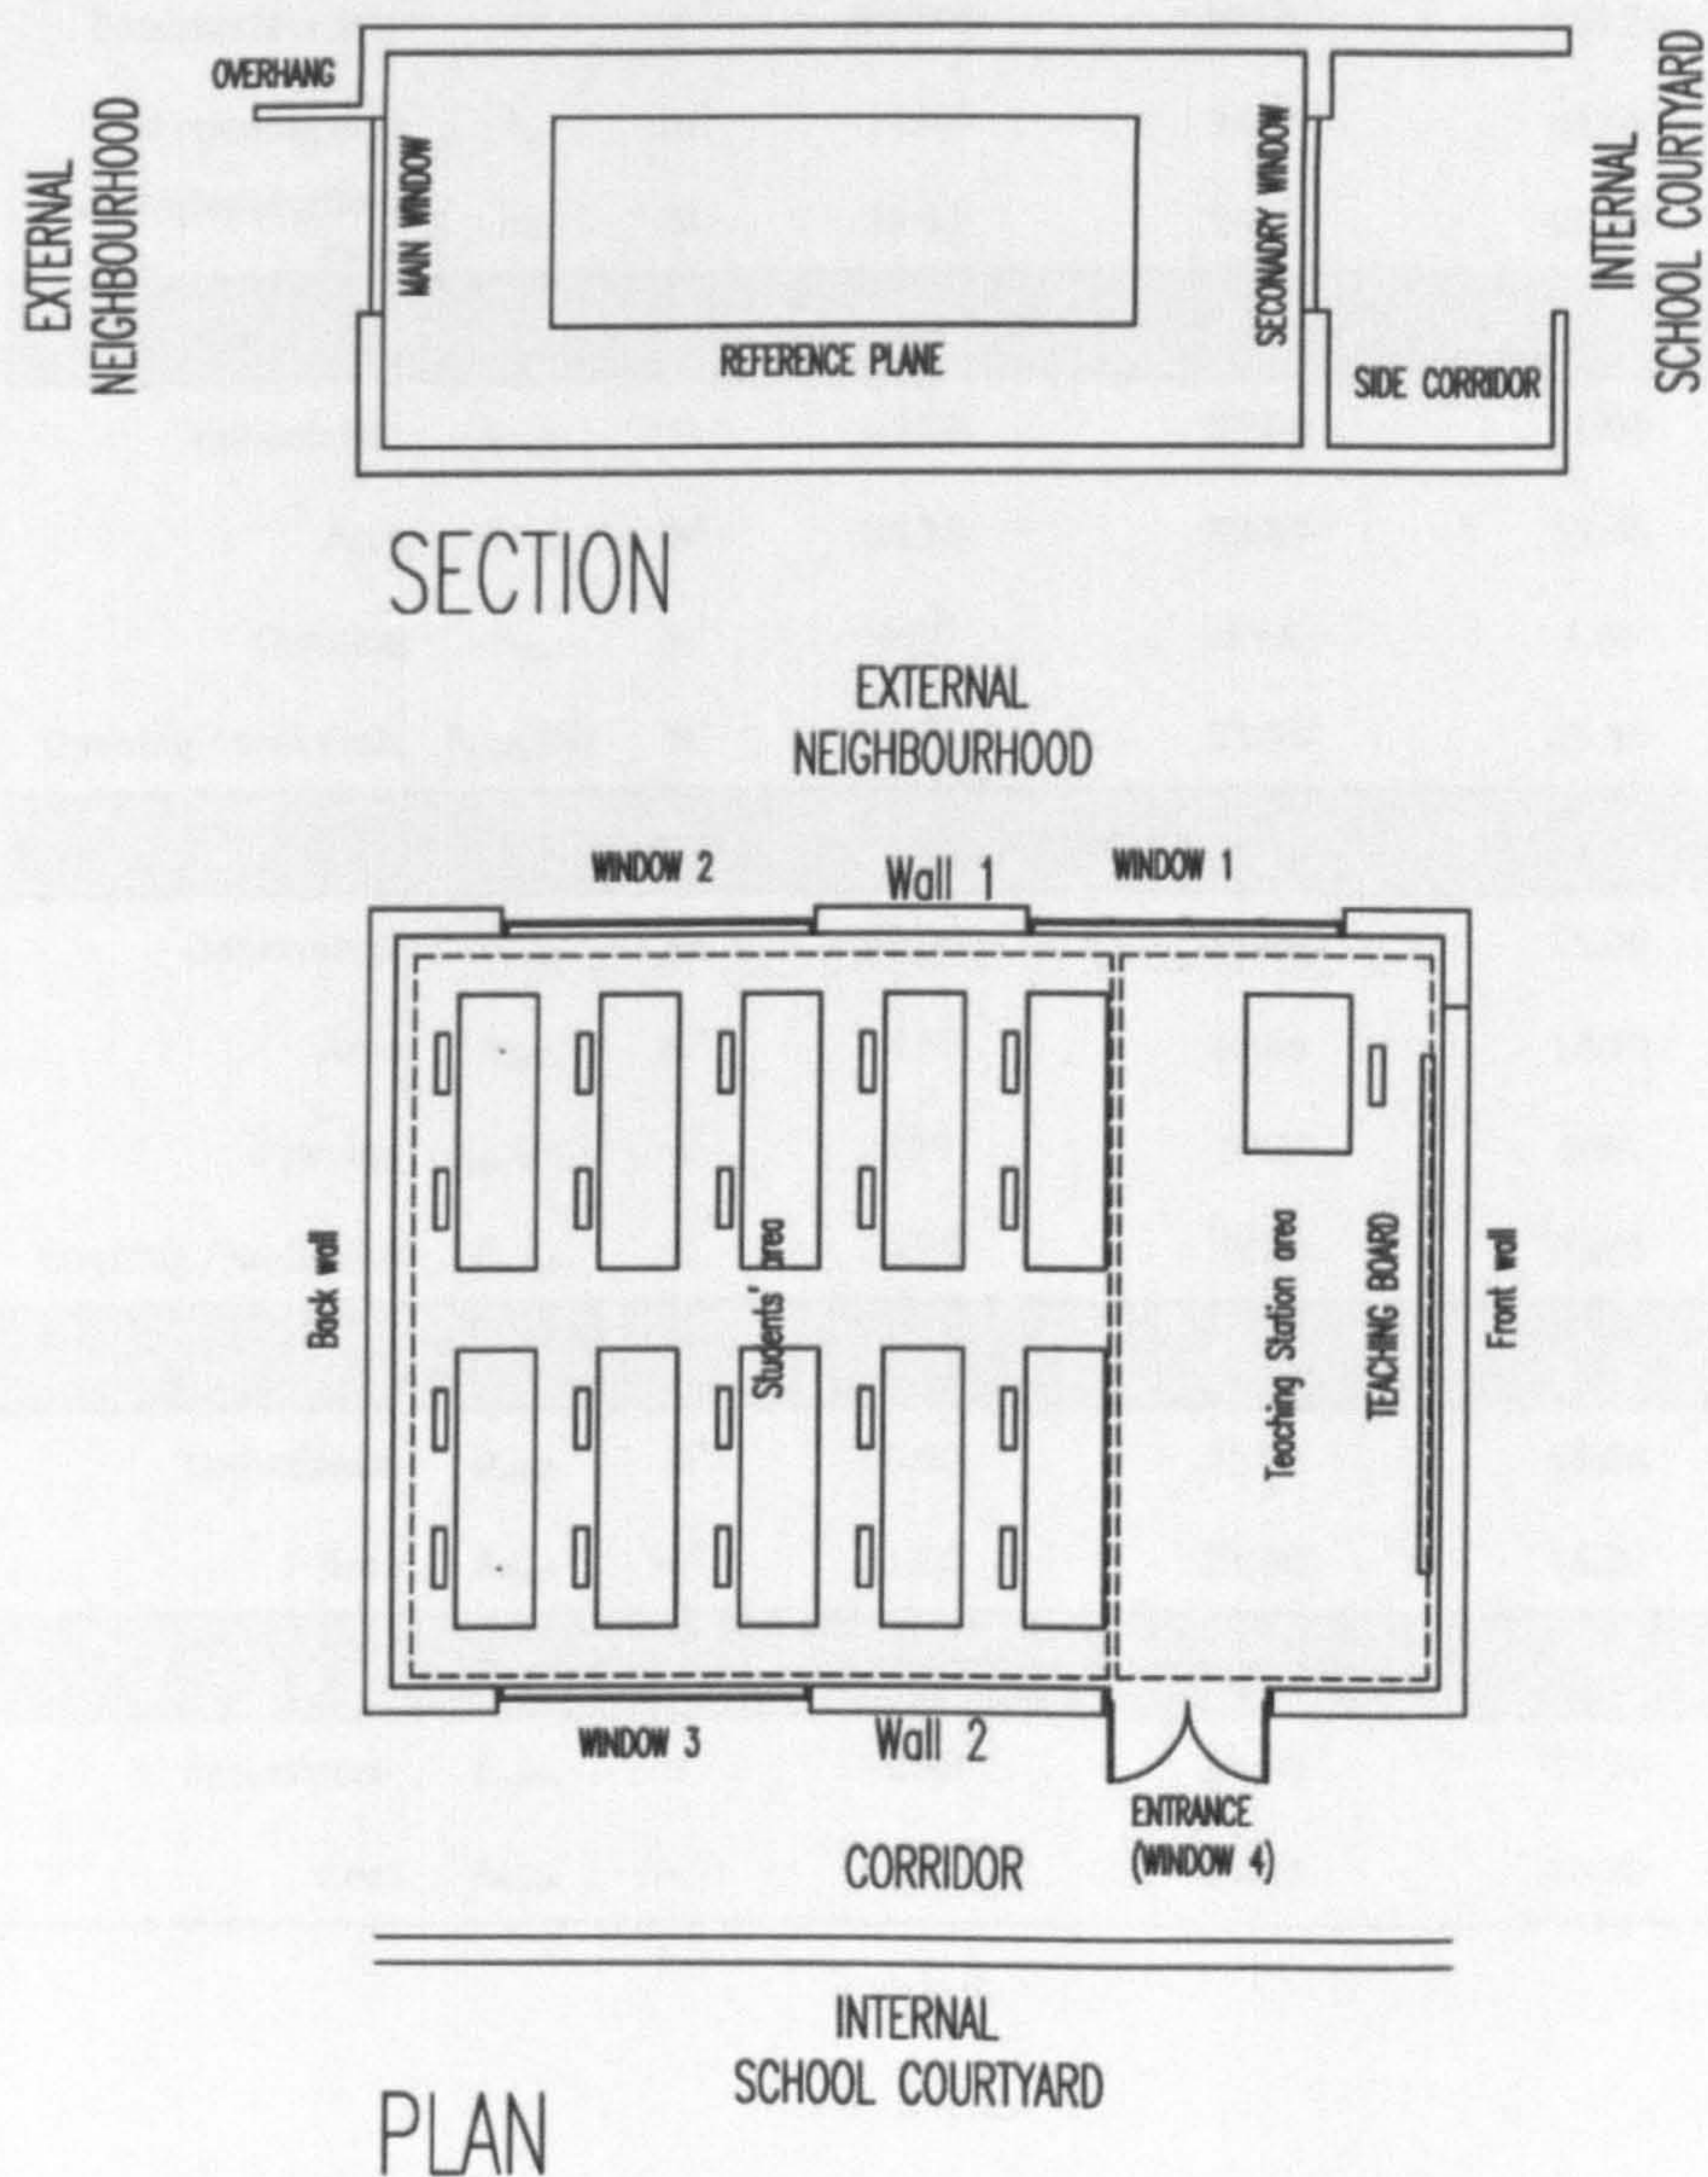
Typical cross section and plan of the surveyed classrooms.
